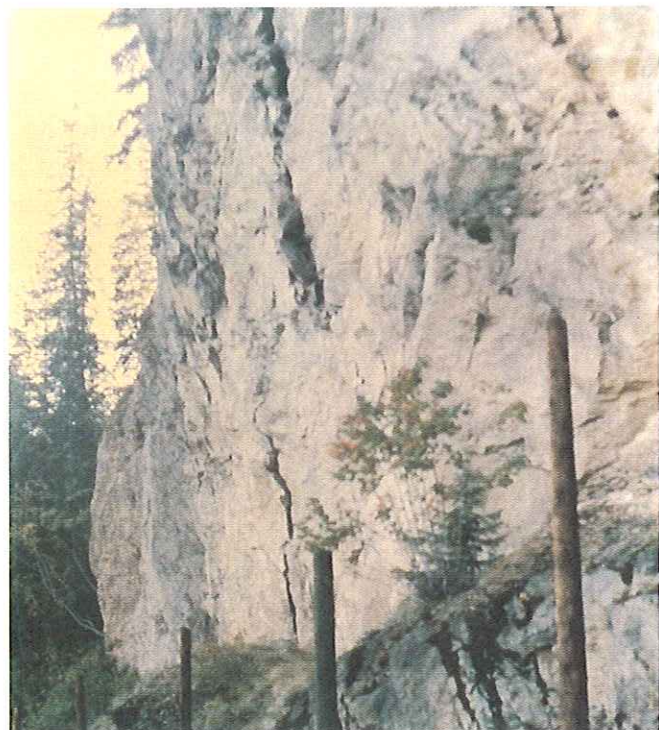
Large slab beginning to topple. The volume was large enough that it could completely block the highway to traffic. The toppling slab was excavated during a controlled road closure.
